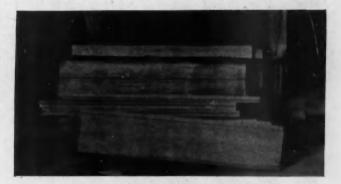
Short Lengths Could Have as Well Been Used to Cut 400 of These Pieces of 1 by 4 by 15-Inch Ceiling Which Were Cut from 18-Foot Lengths.
